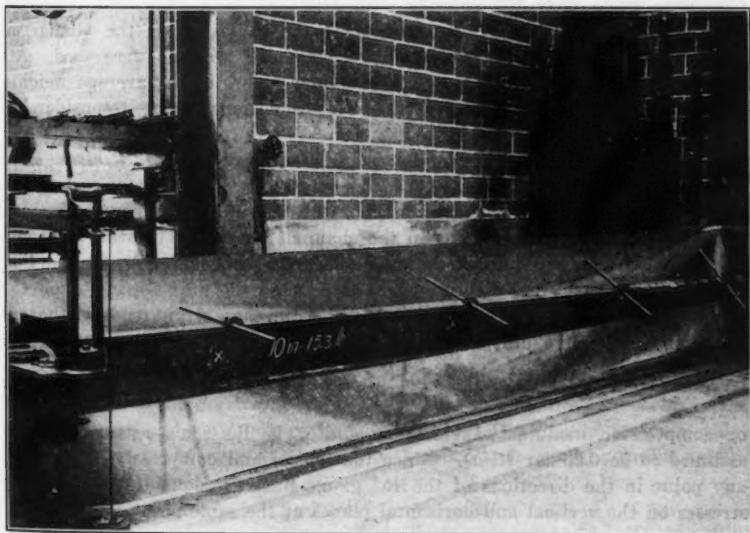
VIEW OF CHANNEL IN TESTING MACHINE.
